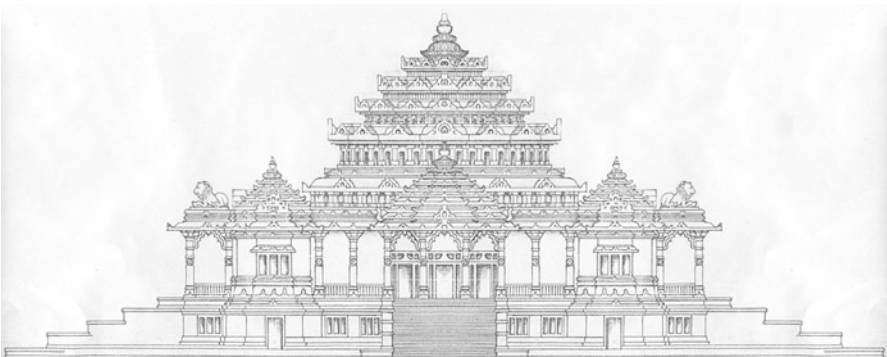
Drawing of proposed front elevation of Vallabh Smarak at Delhi with dome. The external design of the actual temple building was realized with a stepped roof, 1979. Drawing by Amrutlal Mulshankar Trivedi
